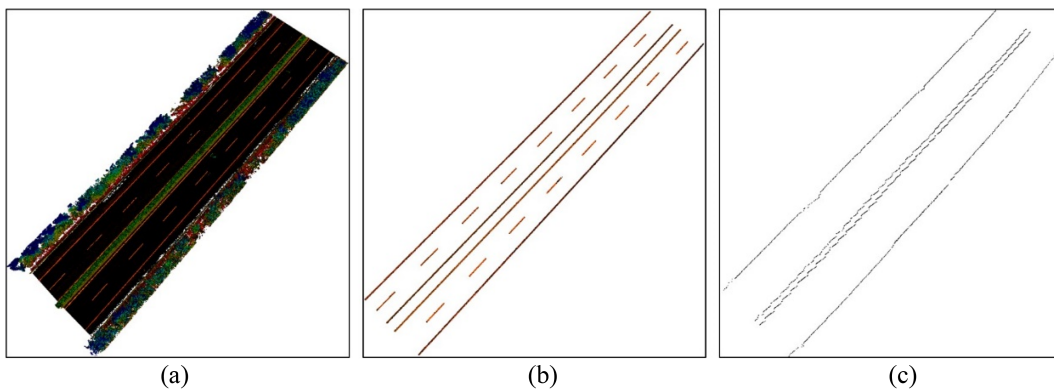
Highway marking and boundary extraction. (a) Raw highway point clouds. (b) Lane marking points. (c) Highway pavement boundary points.
